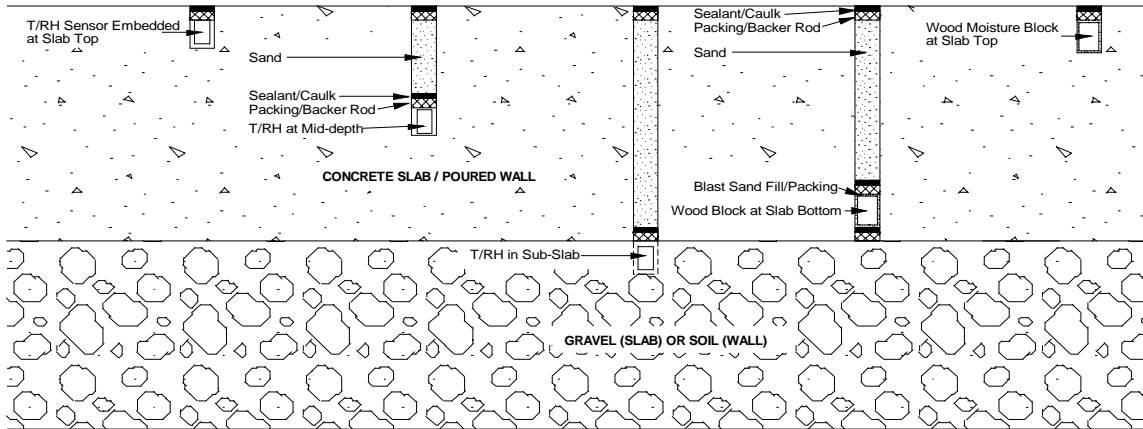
Sectional view of typical sensor placement in poured wall and slab floor clusters. Placement in block walls is similar, but modified for open cores and web.
